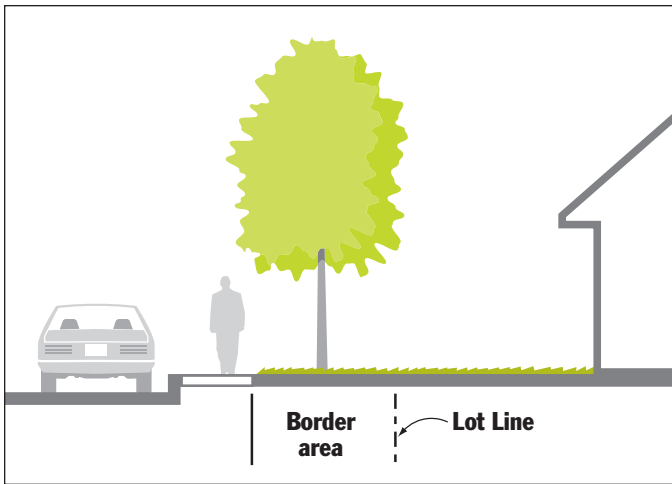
Sidewalk adjacent to curb. Adequate area between sidewalk and property line.
